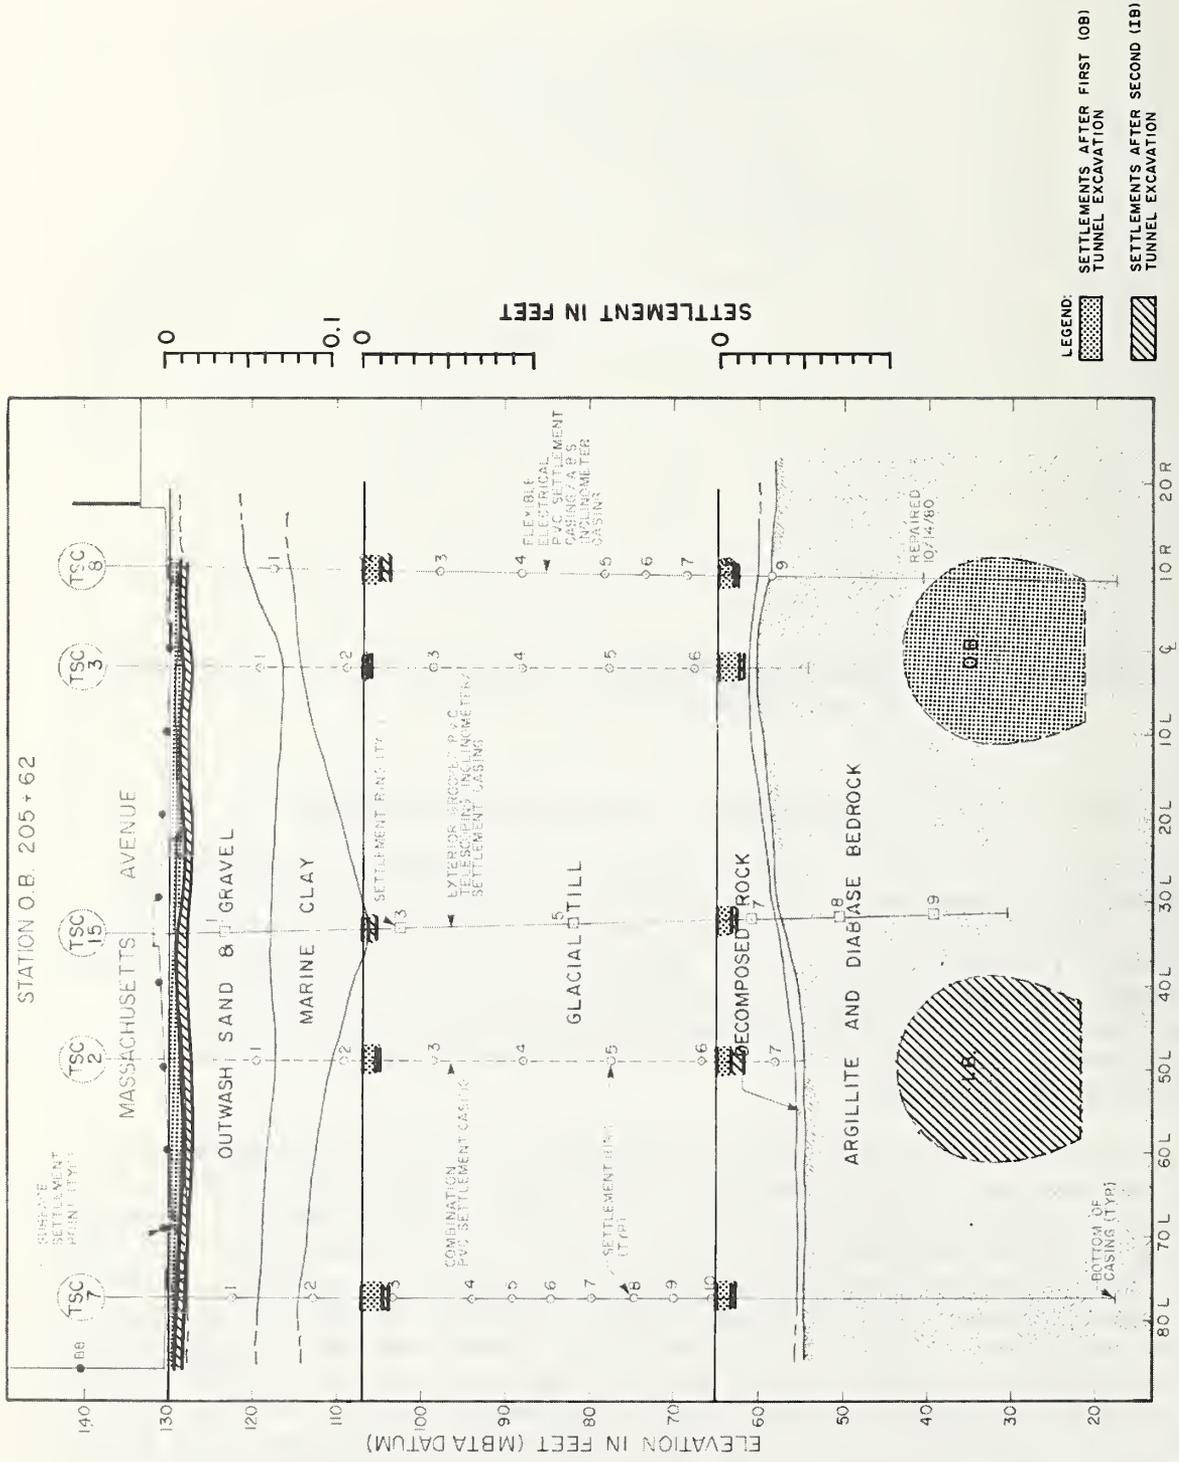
PROFILE OF SETTLEMENTS - NORTH SECTION
